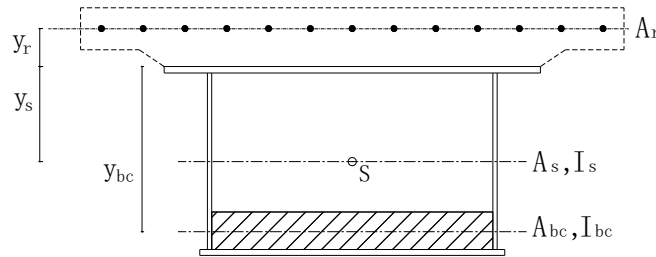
Definition of cross-sectional parameters of double composite section after concrete cracking
